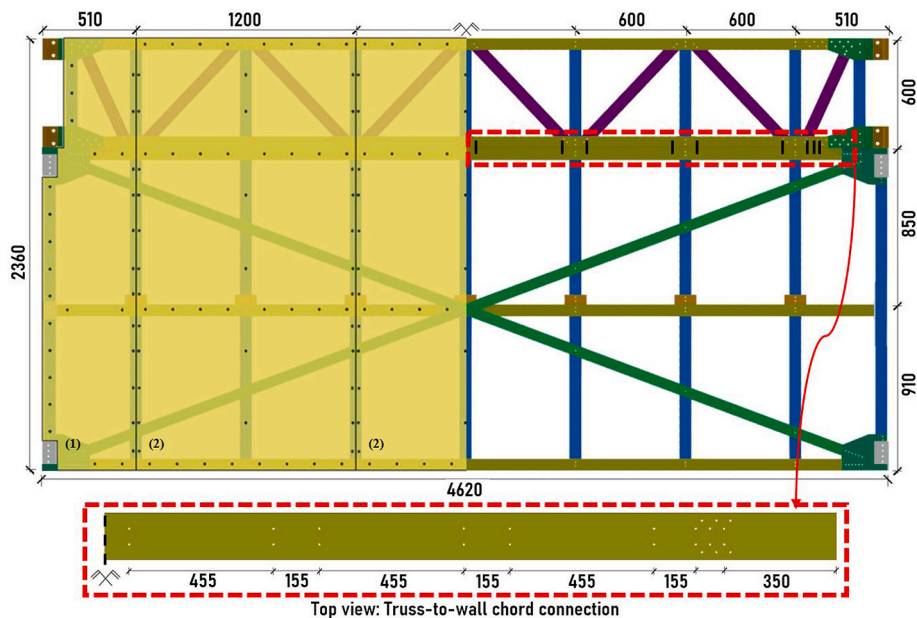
The LSF wall with OSB, assembled below the truss-girder (nominal dimensions).
